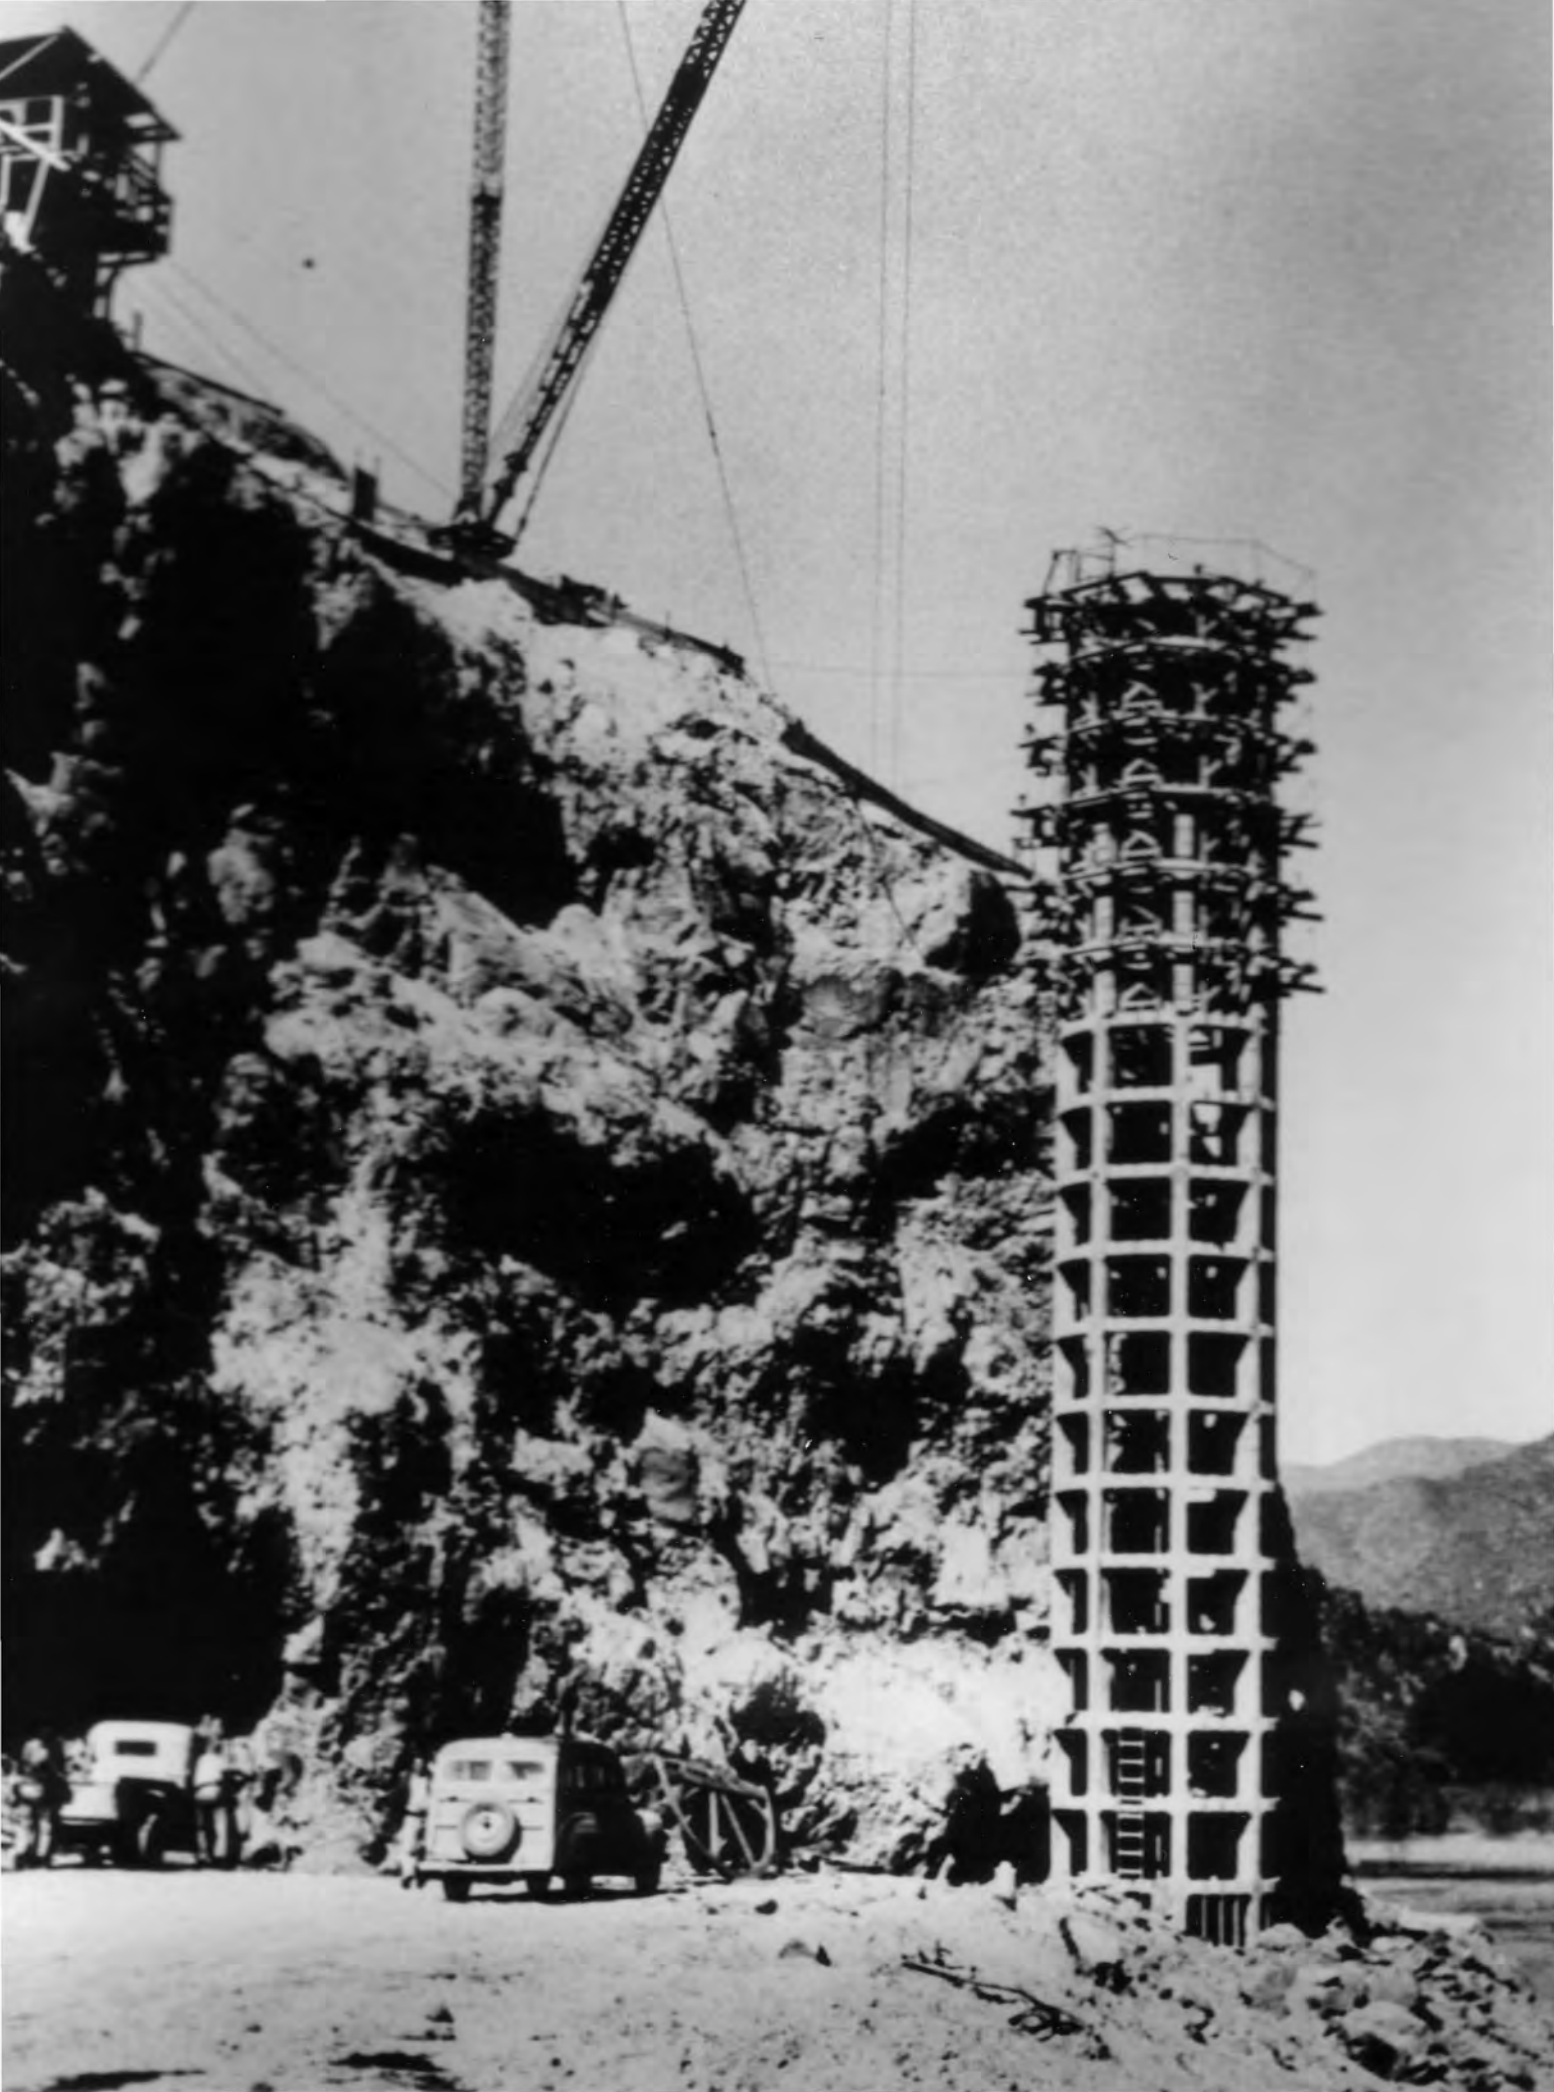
OUTLET CONTROL TOWER LOOKING NORTH IN RESERVOIR AREA.
